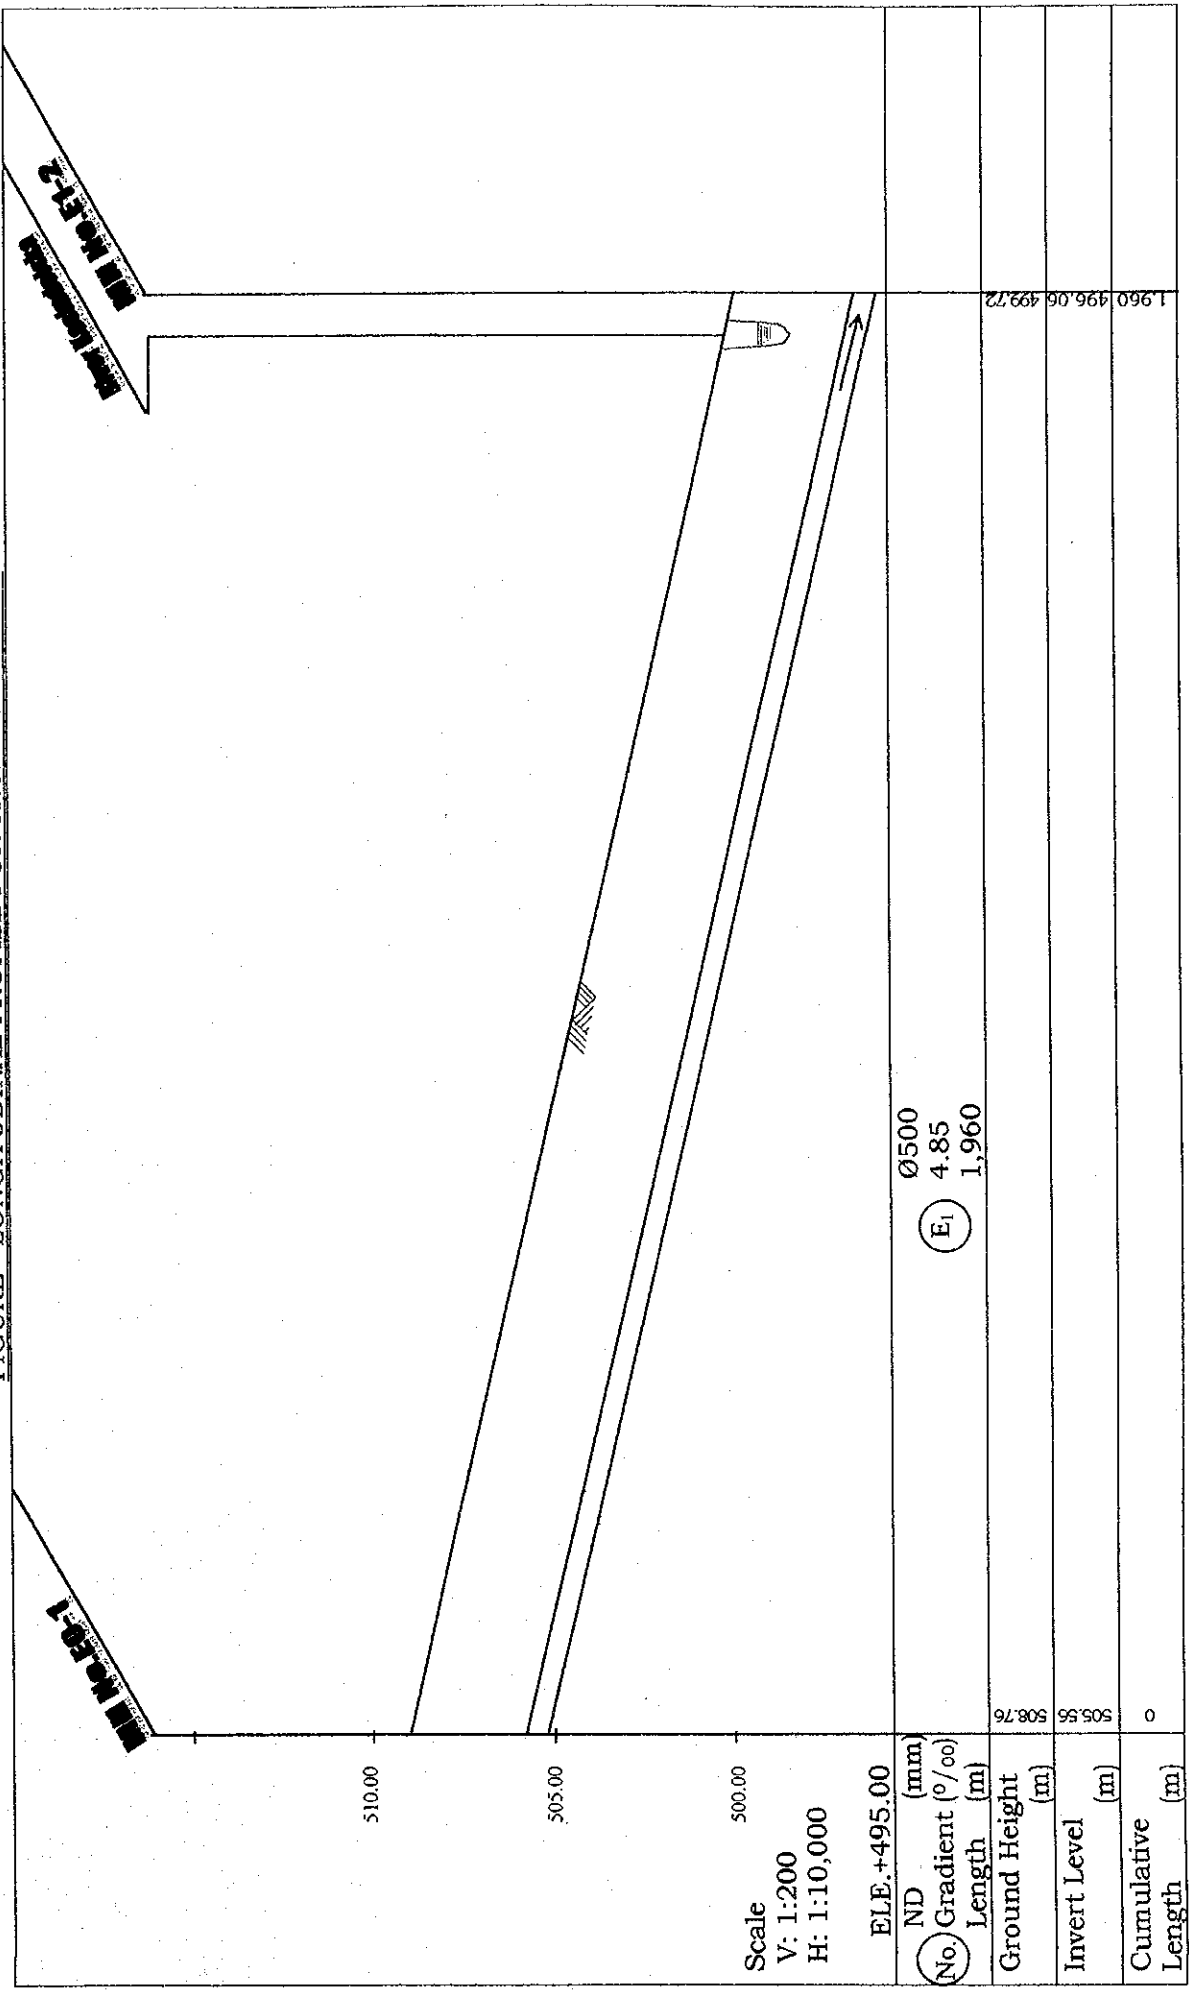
FIGURE LONGITUDINAL PROFILE FOR TRUNK SEWER - D
